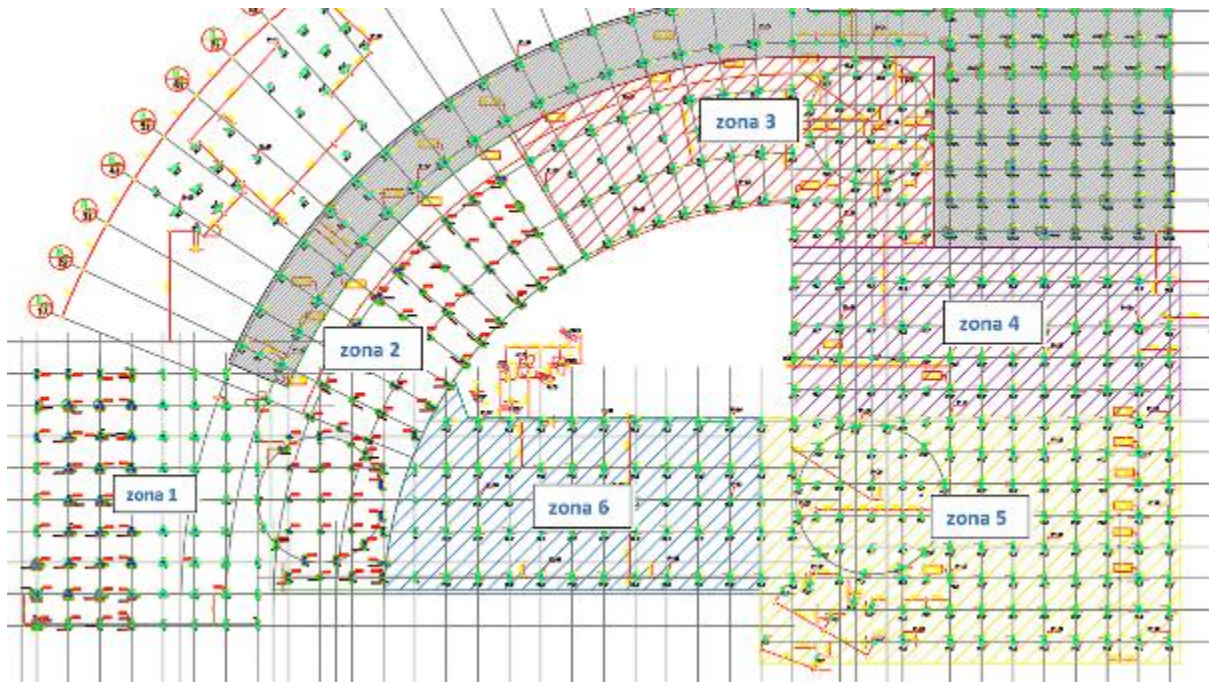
Six-zone structural work plan and principal access routes. Source: project shop drawing, 2023
